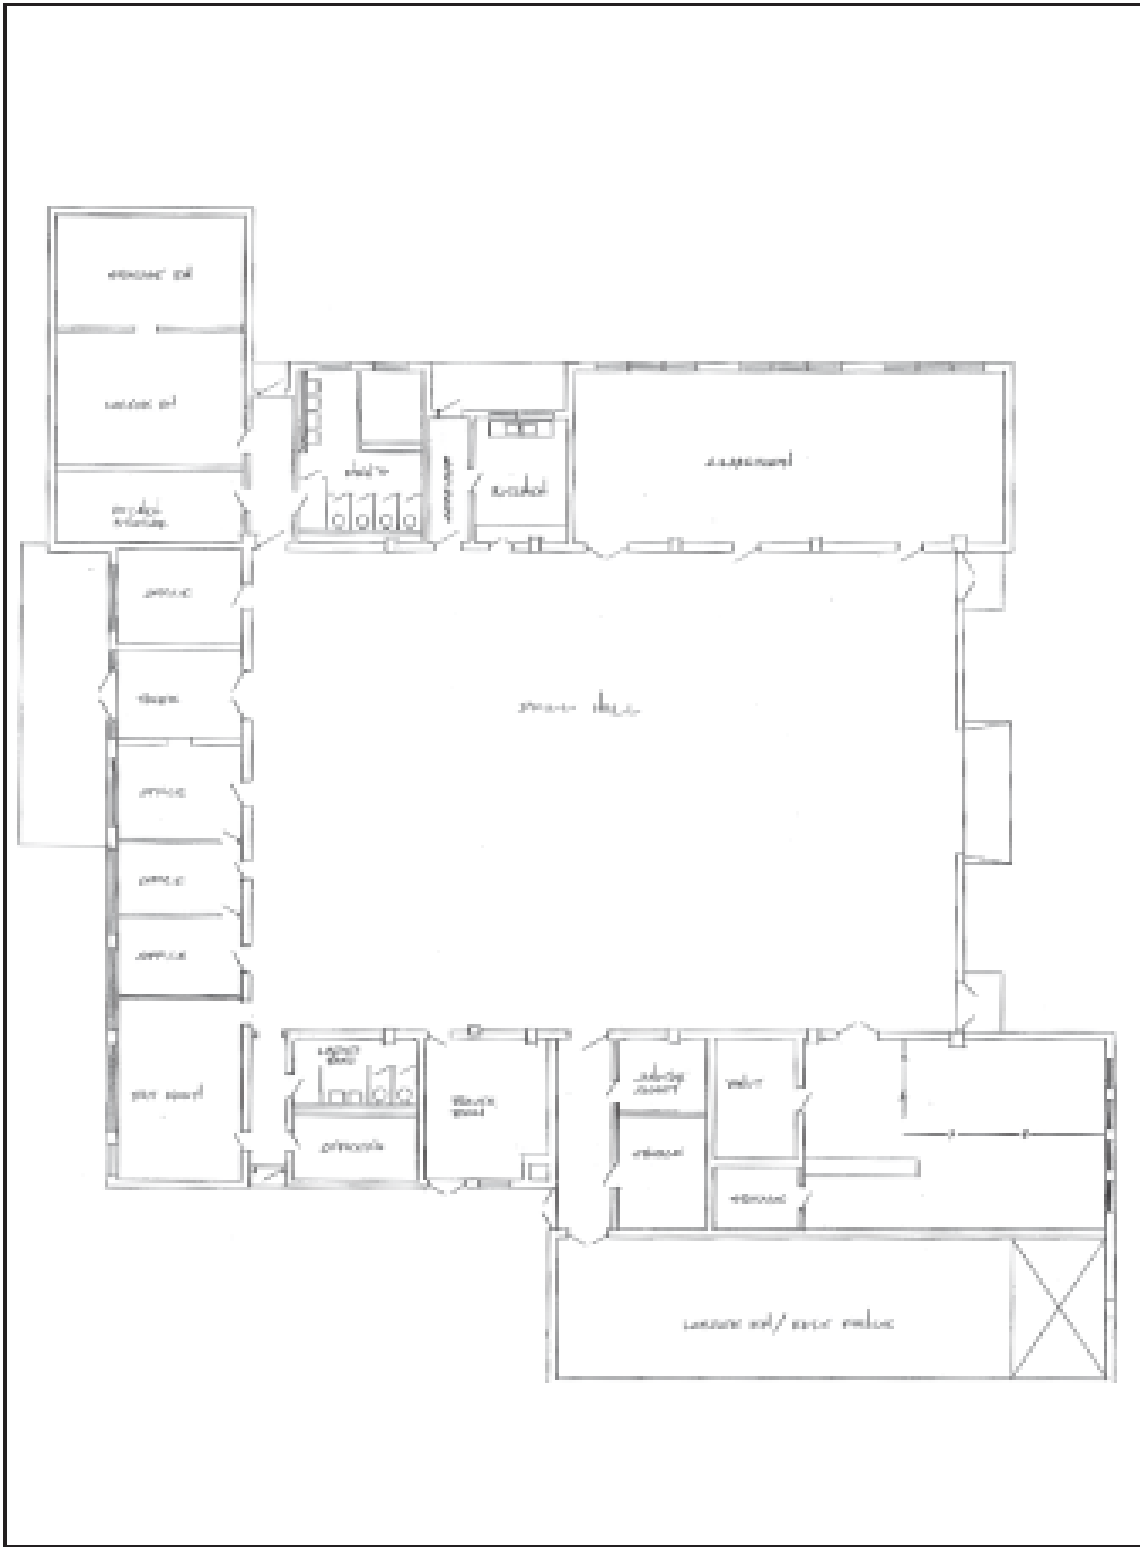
Type-Alt-A Floor Plan, North Carolina (Privett 2020: 5).
